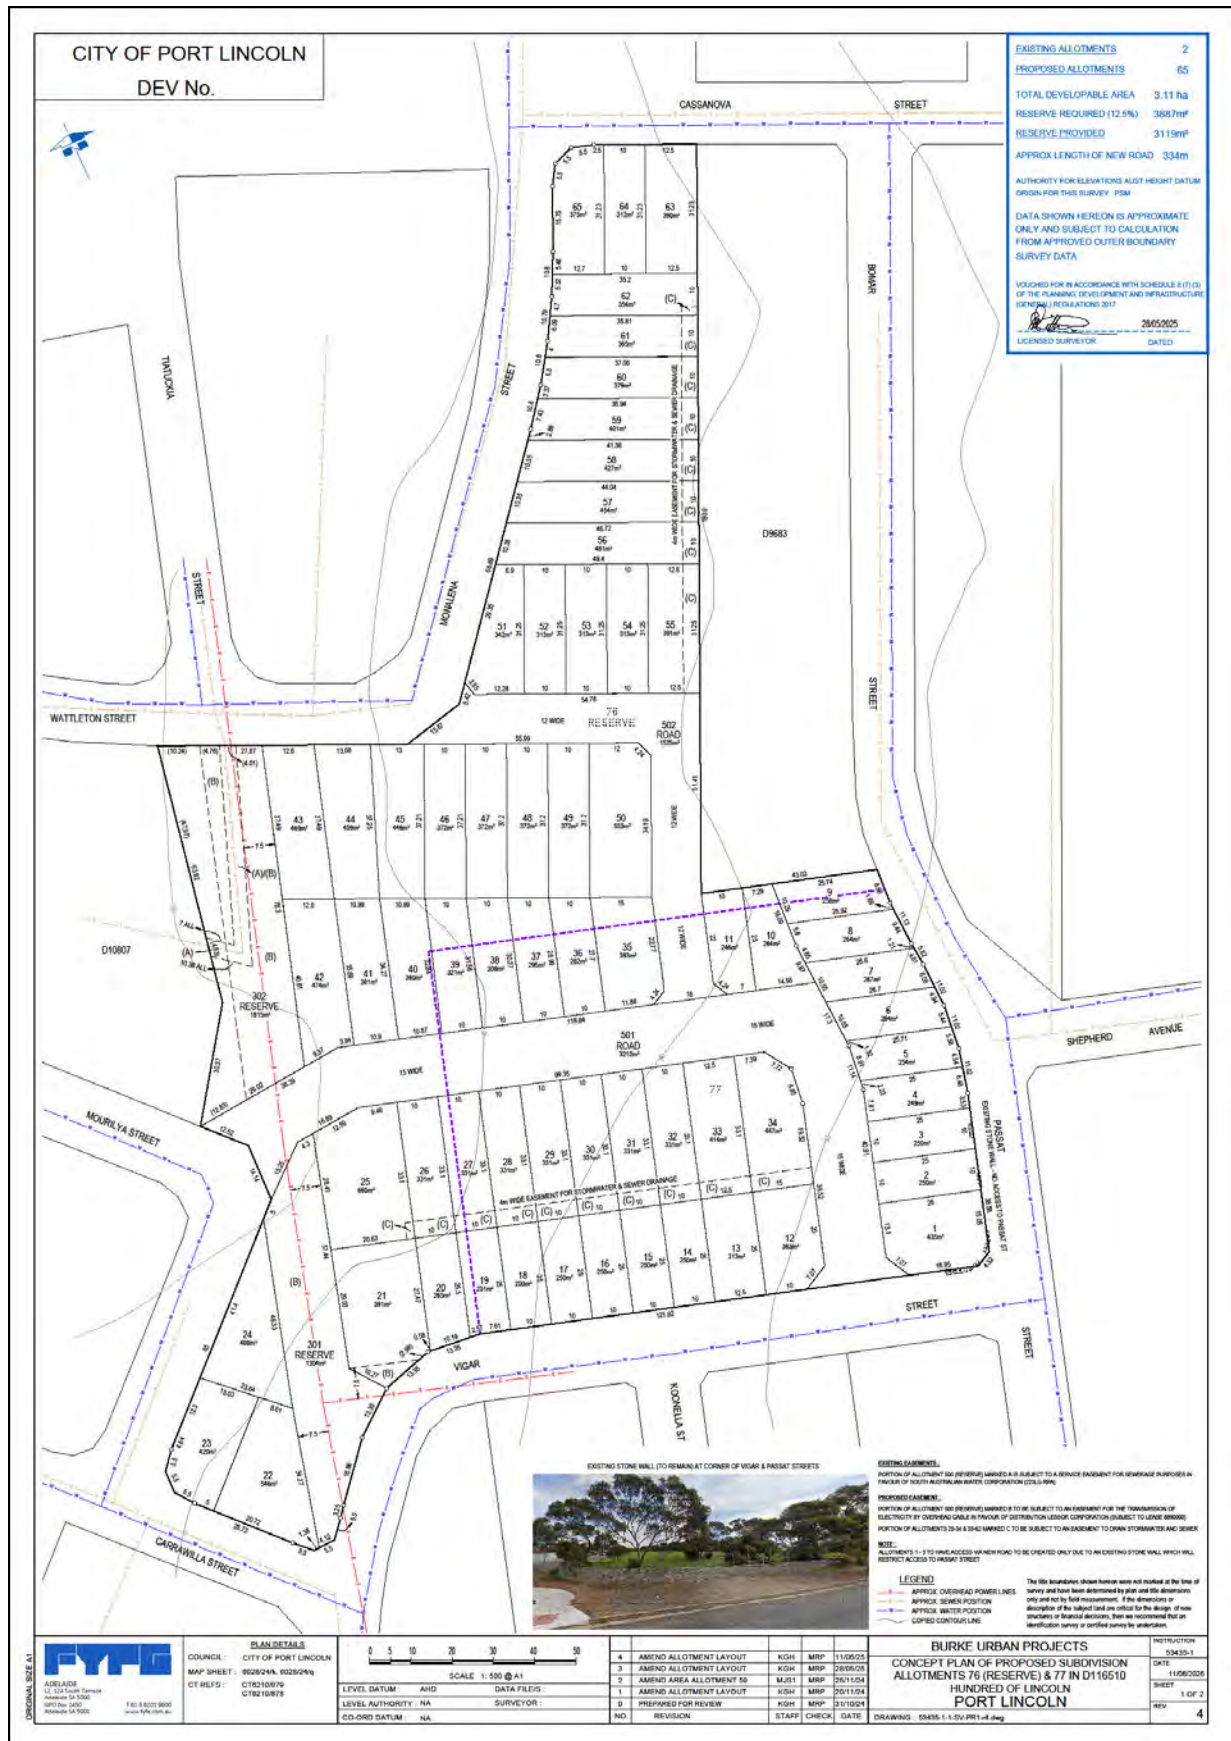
Subdivision plan (Passat St application area within blue dotted line)
